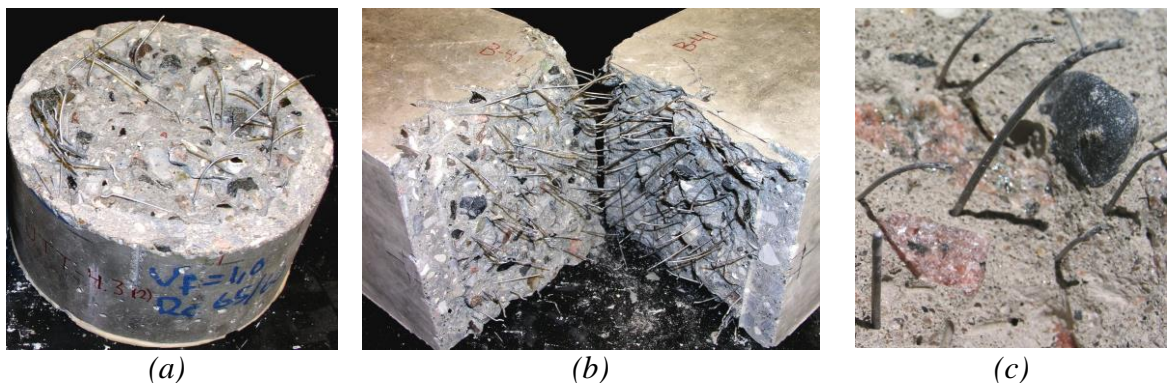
Fractured specimens with fibres protruding: (a) uni-axial tension specimen; (b) beam specimen; and (c) close-up of an end-hooked fibre that has been straightened during pull-out.
